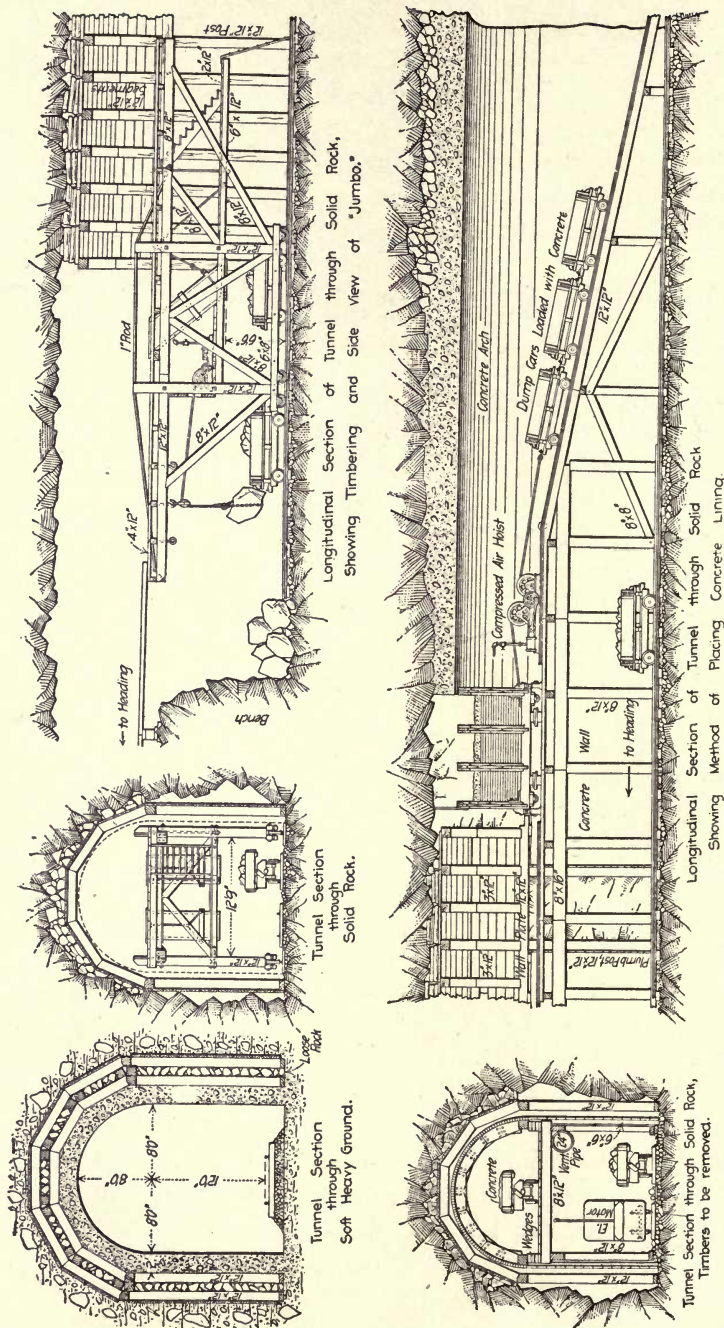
Cascade Tunnel: Showing Sections of Tunnel and Excavating and Lining Systems.
